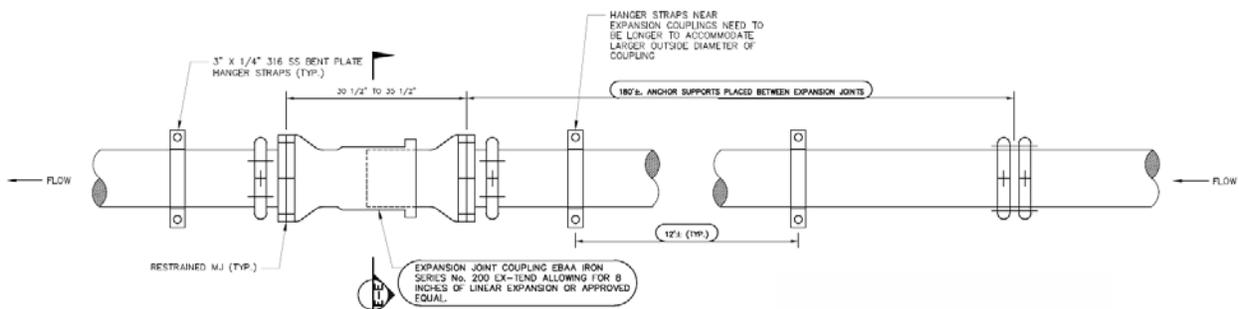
Design of expansion joint coupling detail. (Plans 2017)
